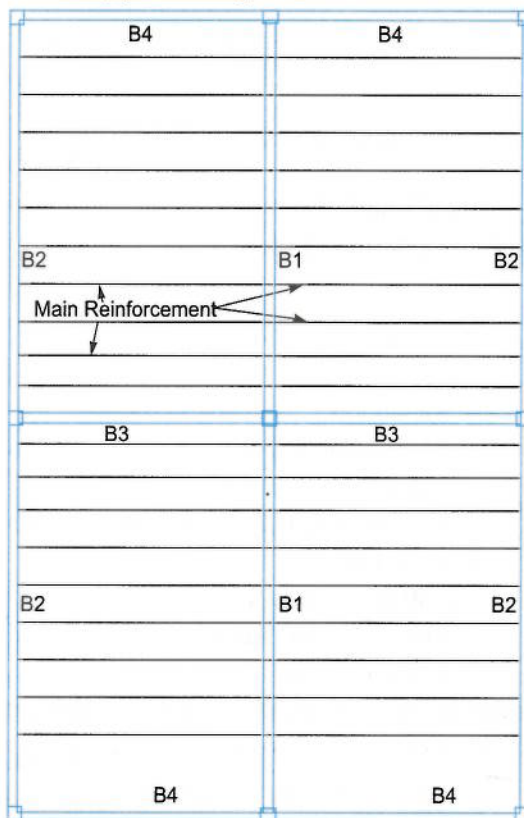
A typical floor plan in which Beam and Slabs are cast monolithically.
